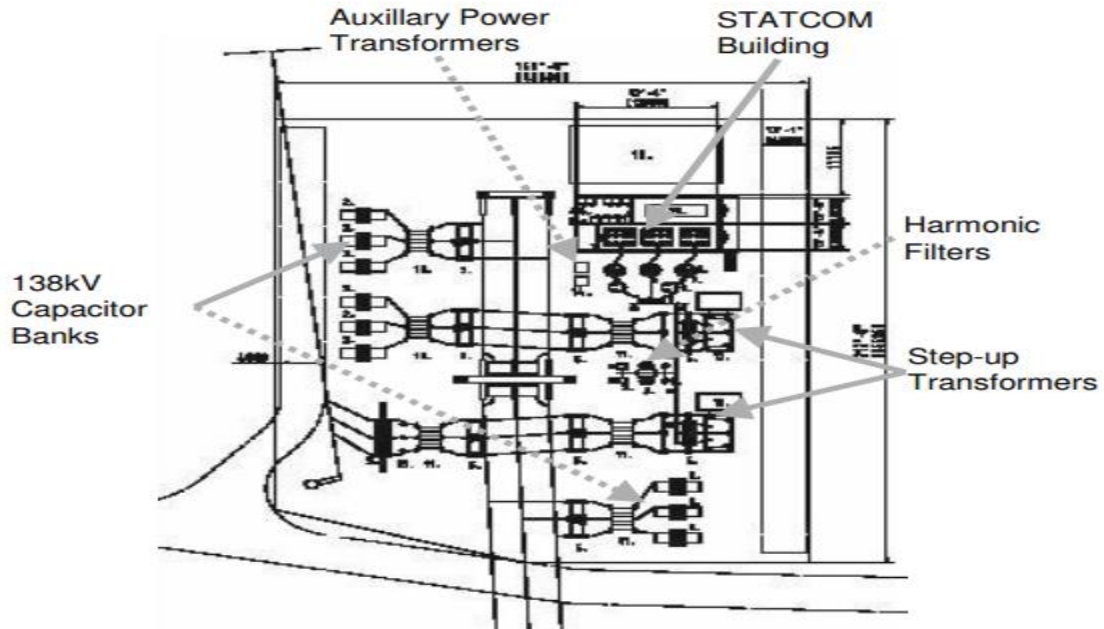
Typical substation layout with STATCOM (Source: ABB) [19]
